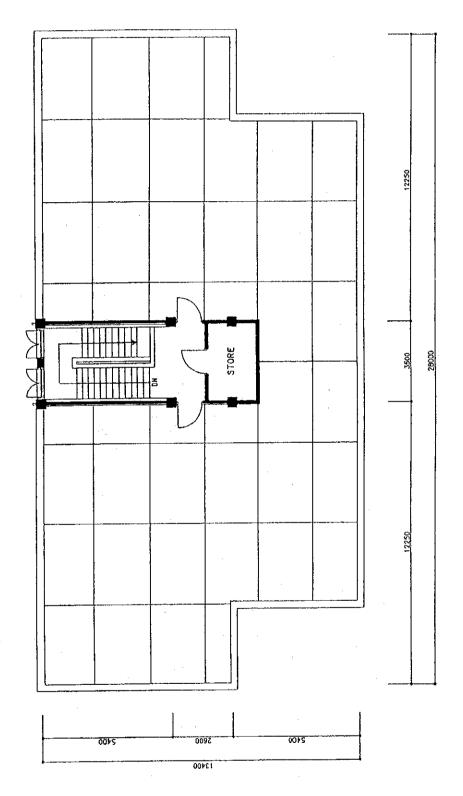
(3) ROOF FLOOR PLAN (5-CLASROOM TYPE)
